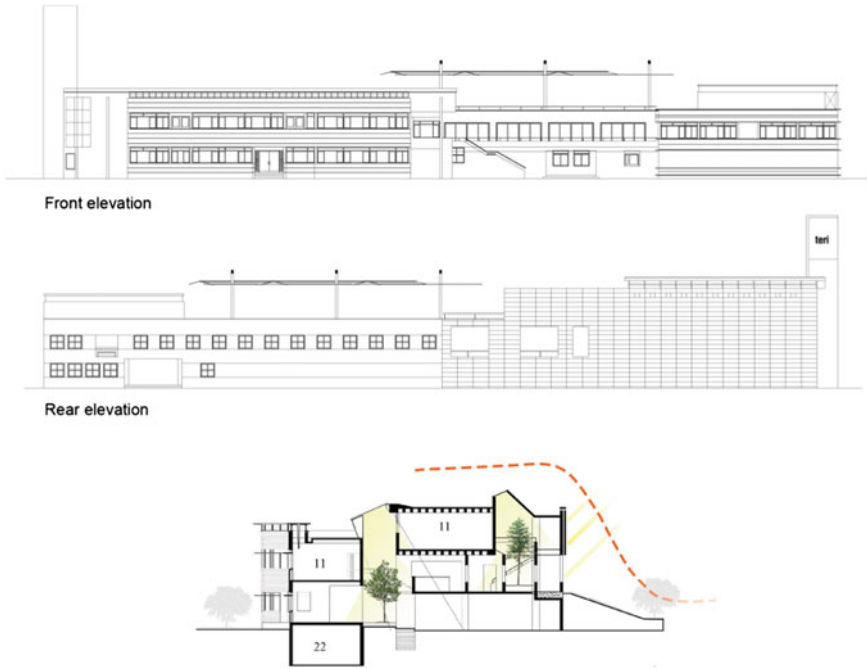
Elevations and detailed section AA, TERI-SERC (Courtesy architect Sanjay Mohe)
